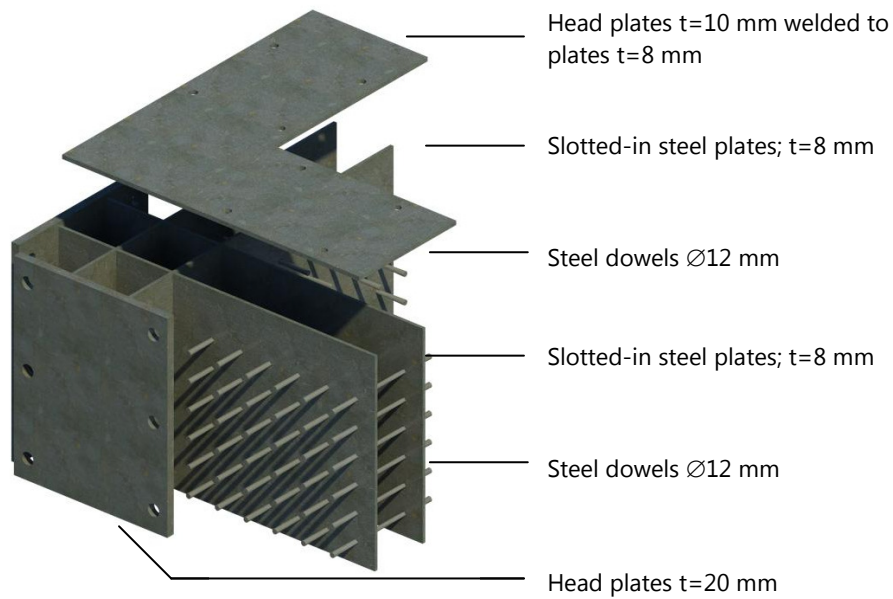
; Slotted-in steel plates with head plates for two outriggers in two directions at a corner of CLT core
